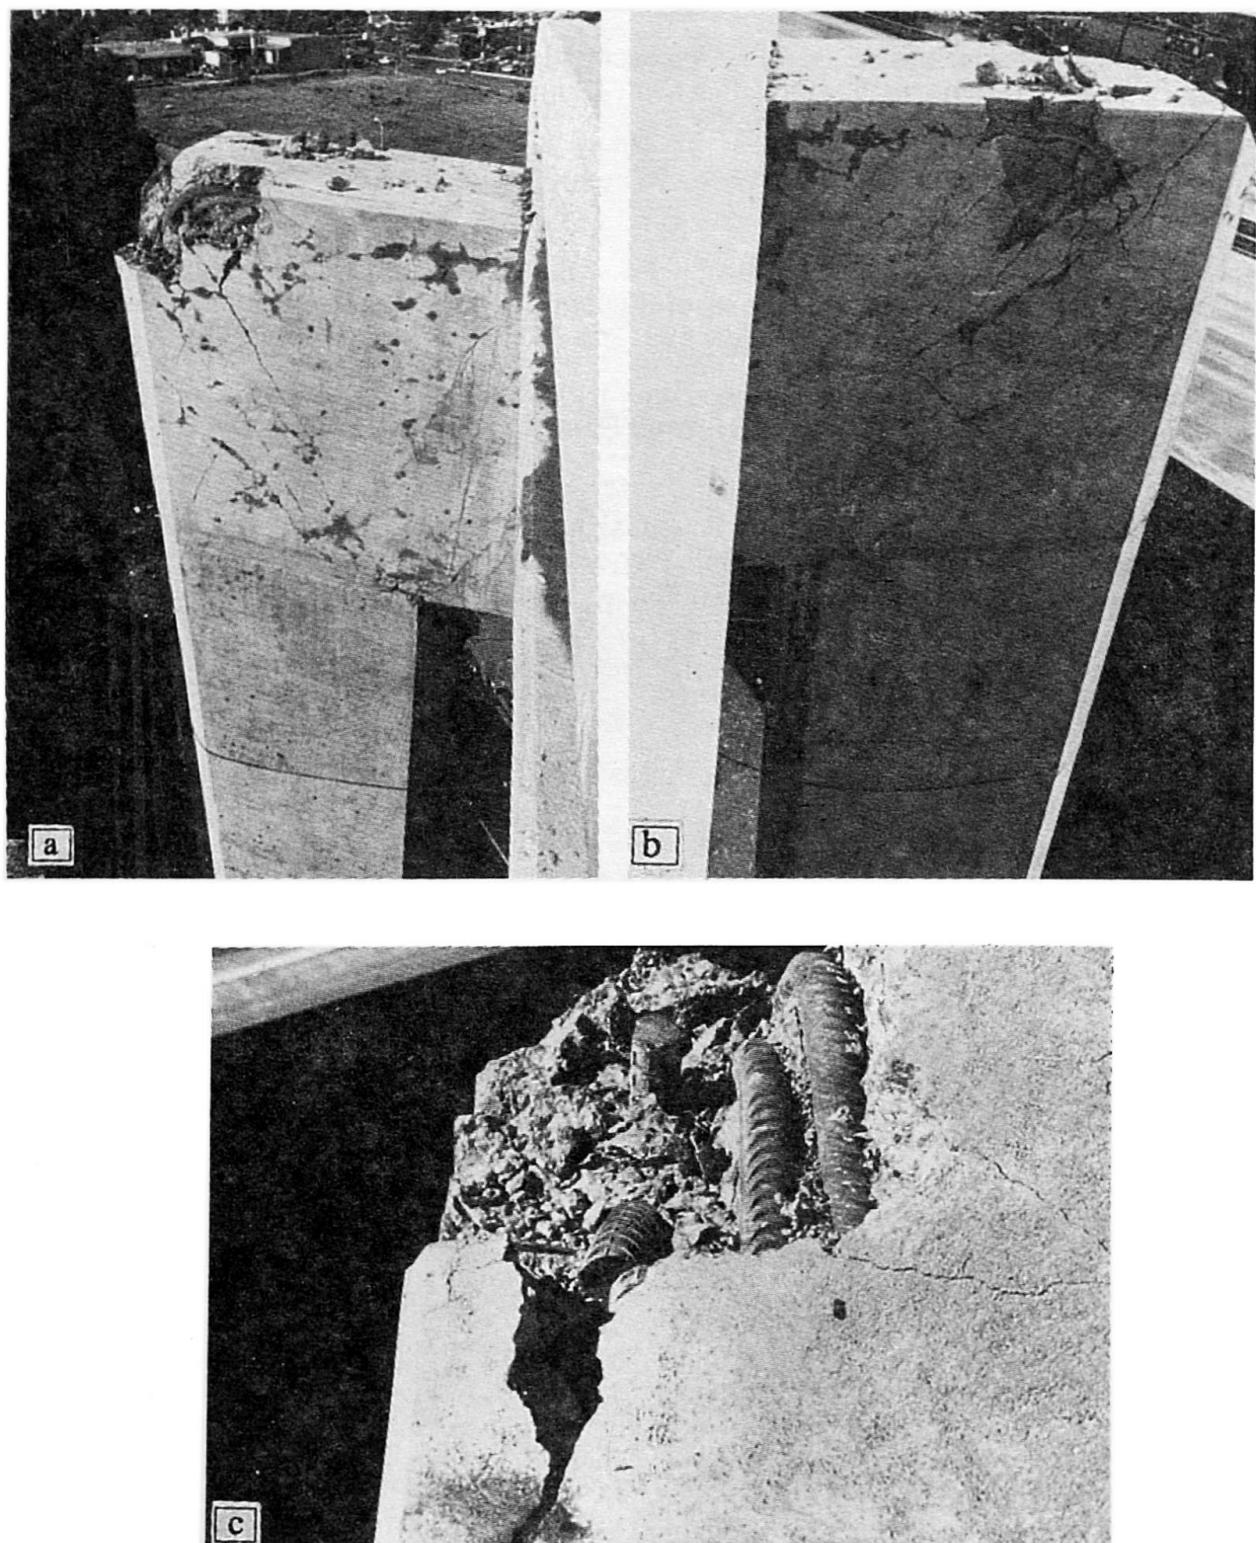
I-980 Oakland, CA, Encountered Damage Patterns
